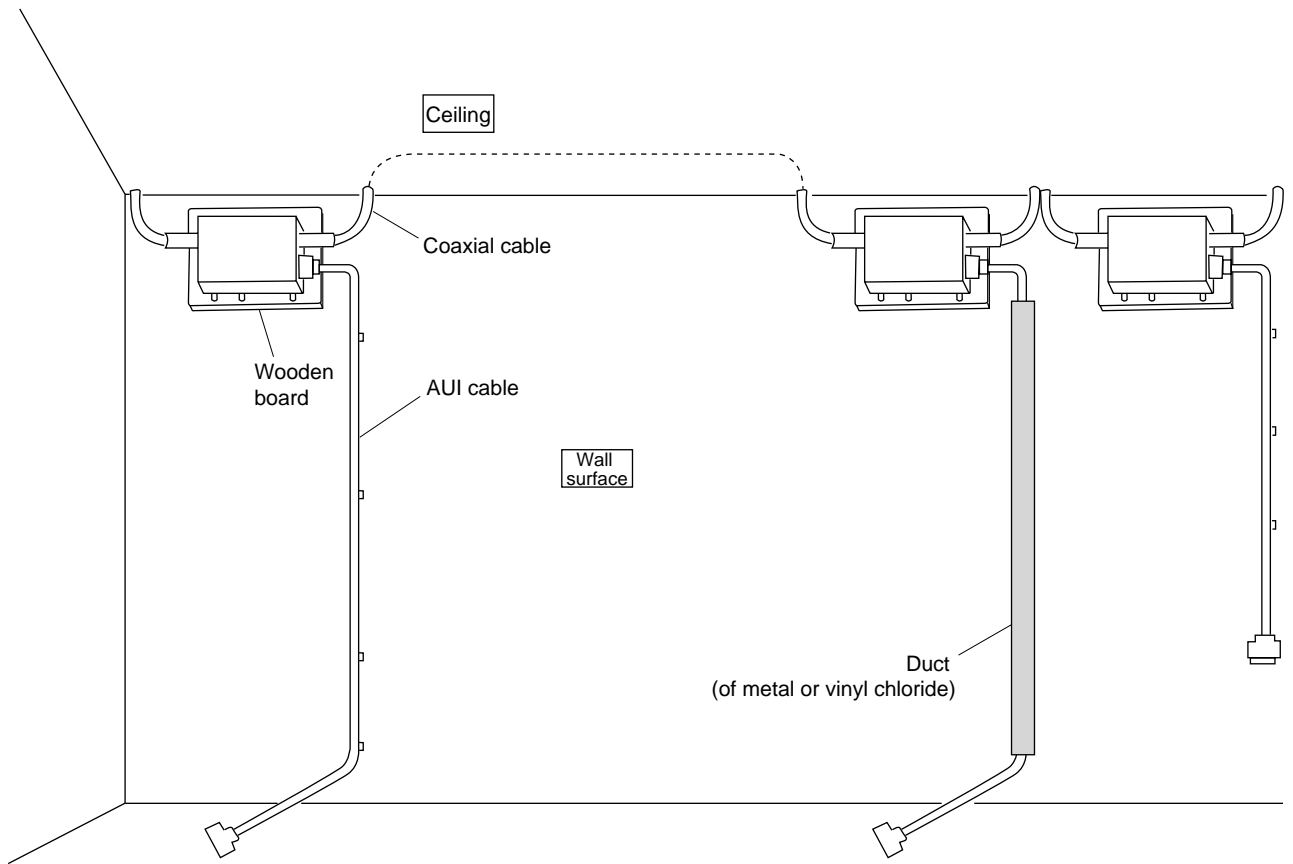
(17) Example of Mounting Transceiver and AUI Cable on Wall Surface (1)
